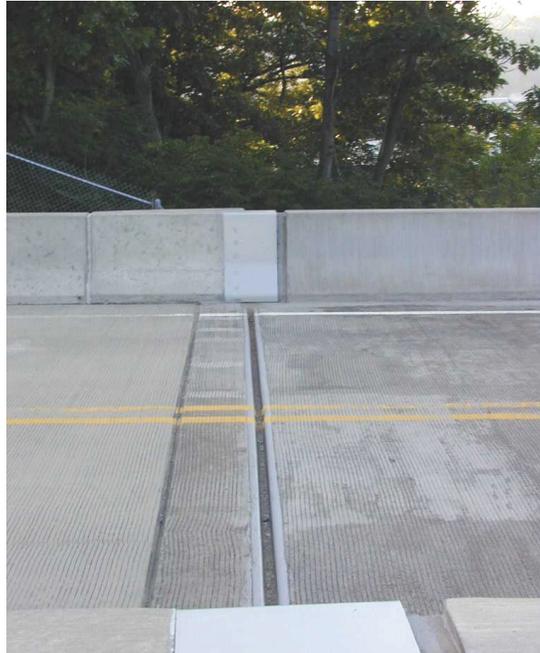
Strip Seal at North Abutment (typ.) – note minor debris accumulation
